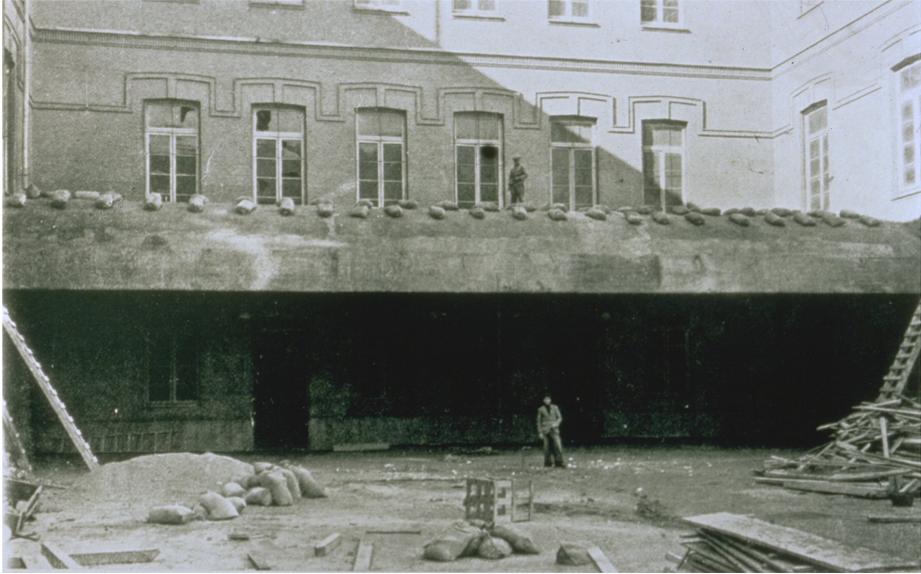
View of the shell built without the stiffening beam after the load test was finished with satisfactory results (AET, file number 275).
